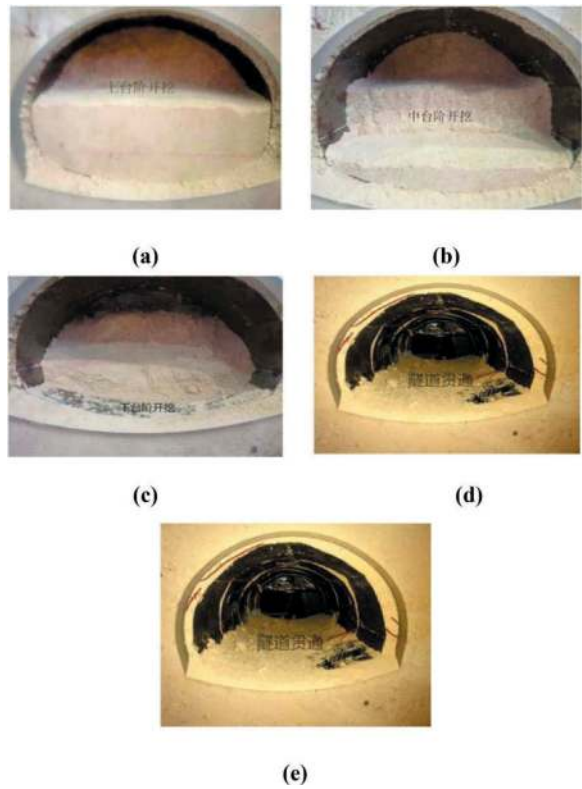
Construction process and form of bench method. (a) Upper bench excavation (b) Middle bench excavation (c) Lower bench excavation (d) Upper penetration (e) Lower penetration
